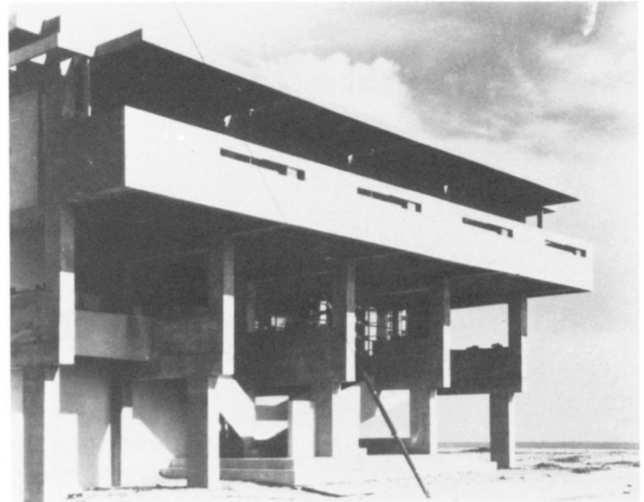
Schindler, Beach House, street elevation (north elevation), 1926. Photo taken before the wall was built (UCSB-ADC).
